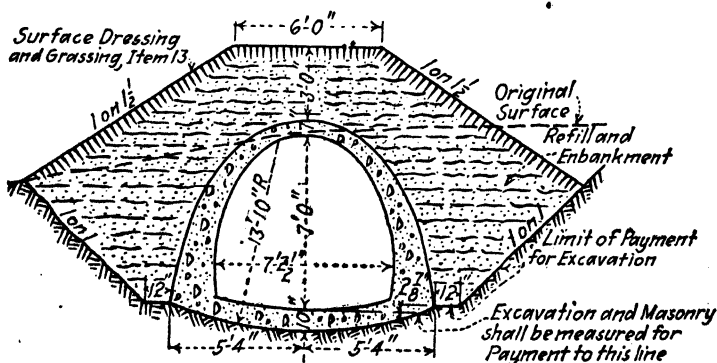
Wanaque aqueduct, type in dry loose earth.
